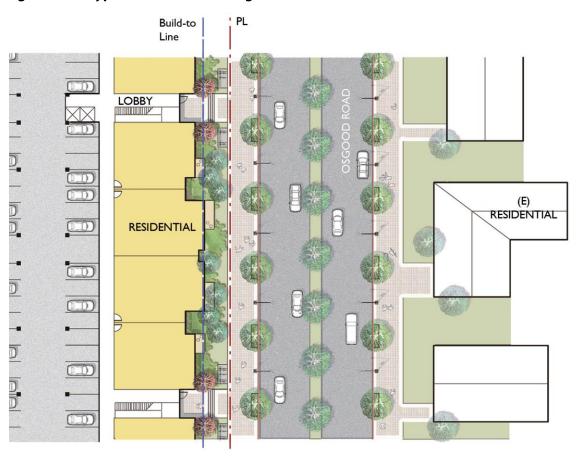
Typical Street Section of Osgood Road with Building Frontages
